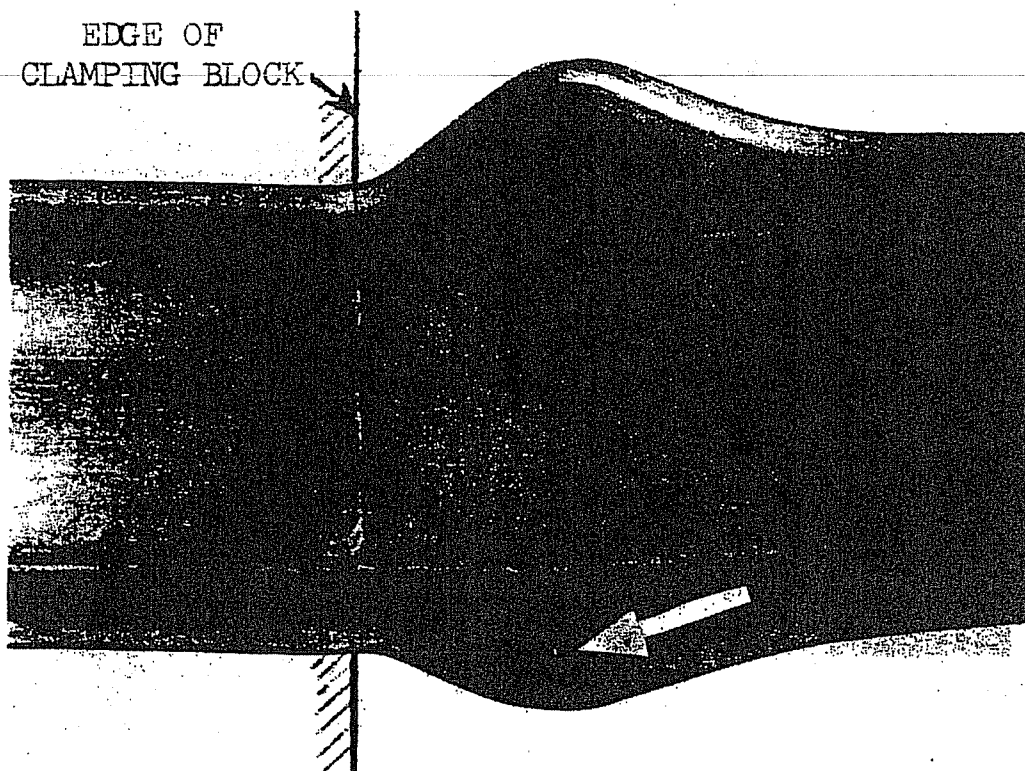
TYPICAL INITIATION OF FRACTURE
